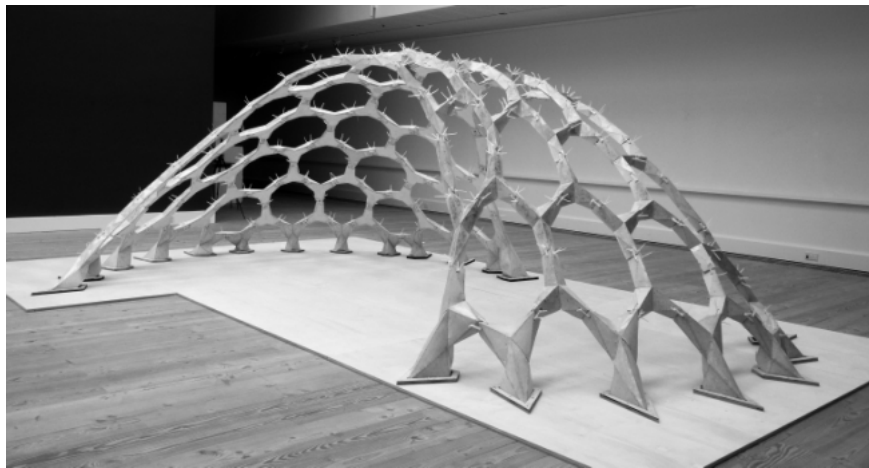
The ReVault case study: A concrete grid shell pavilion made up of 110 discrete elements.
